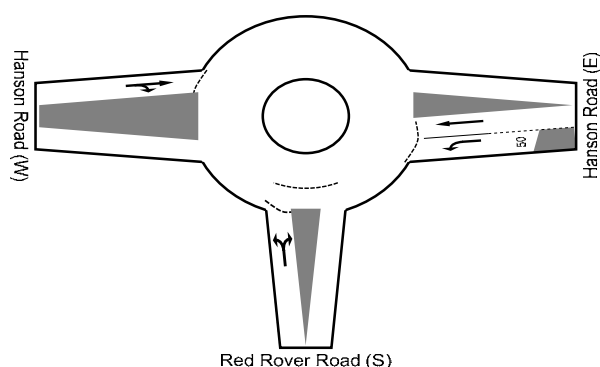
Existing Hanson Road/Red Rover Road intersection
